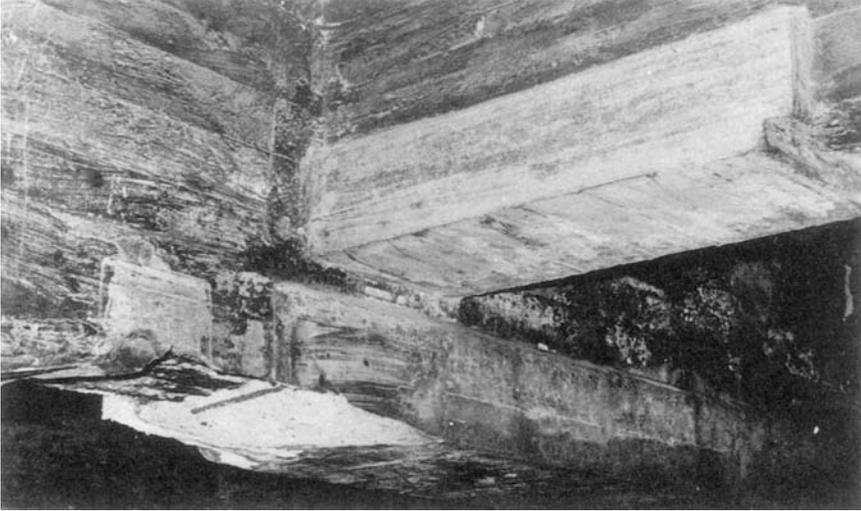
Accelerated corrosion adjacent to the local patch repair of a deck beam (source: Gjrv (1968)).
